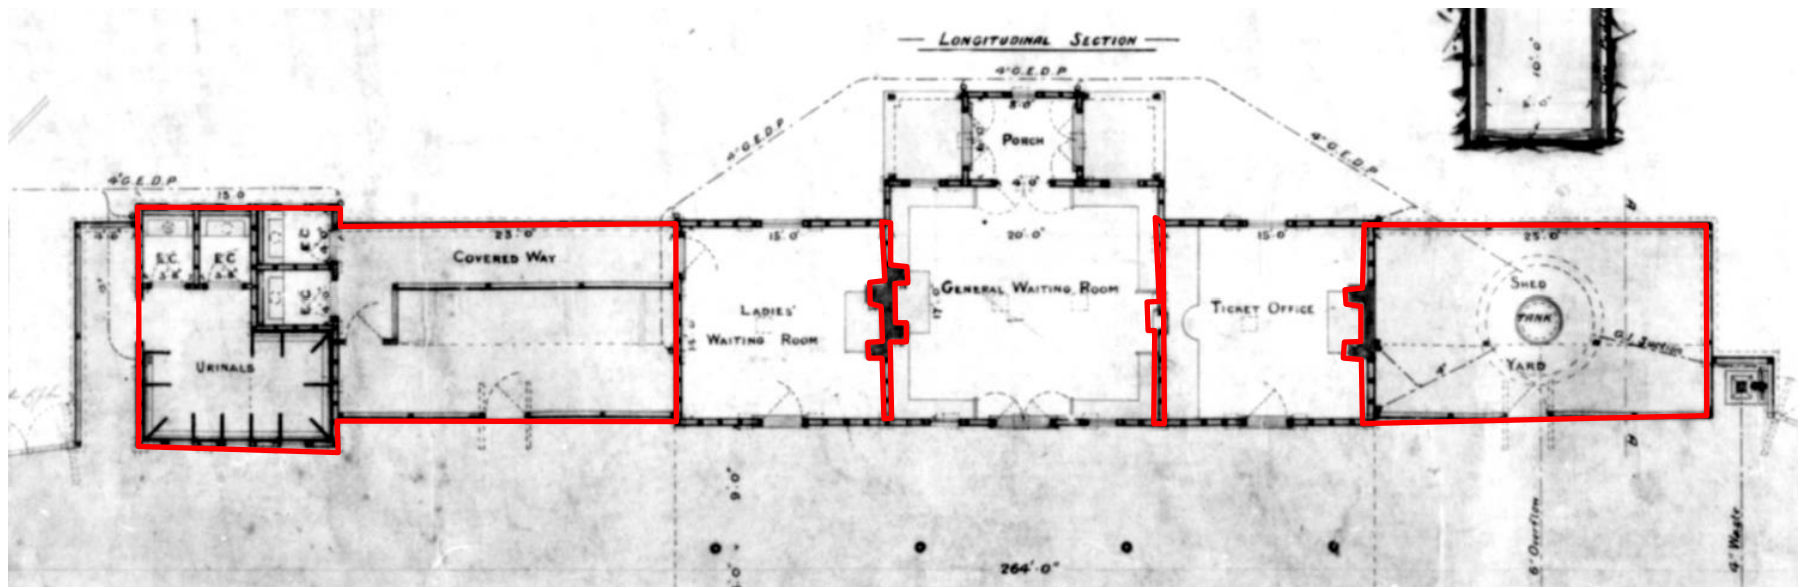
Excerpt from Dapto Station Platform 2 building early plans, 1887 showing initial internal configuration. Source: Australian Railway Historical Society. Red denotes demolished elements
